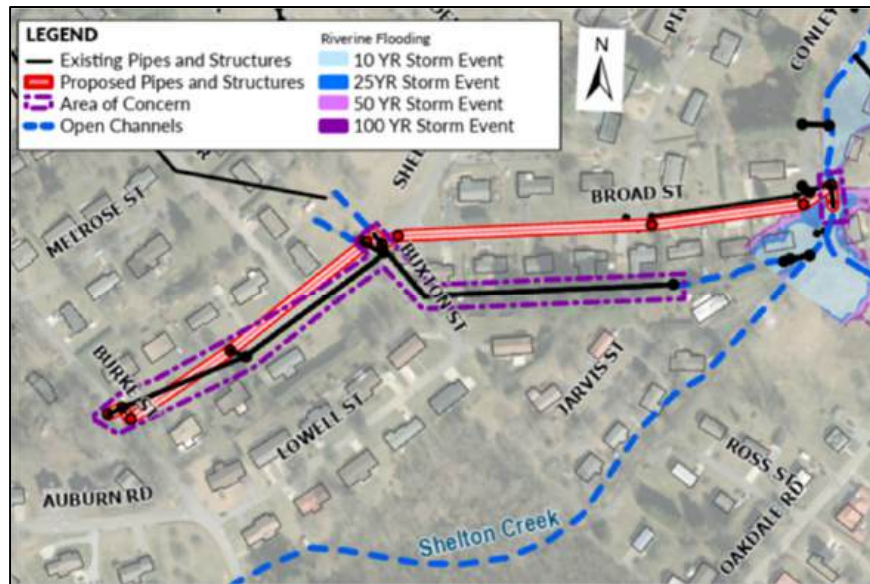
Concept Project Area 3 – Burke Street and Shelton Street
